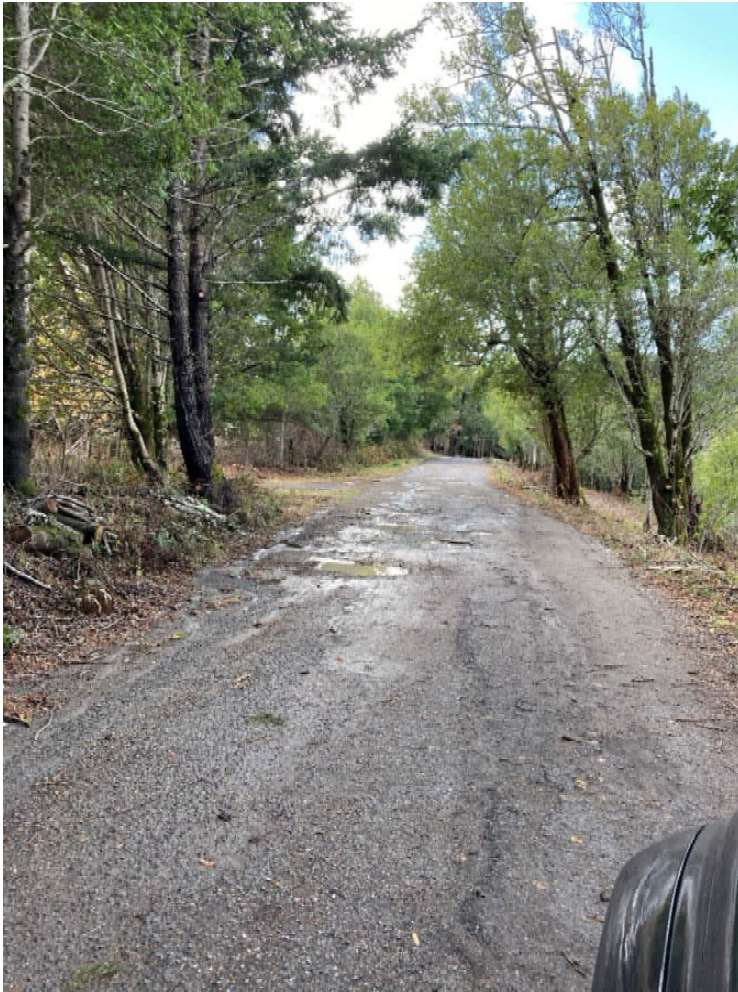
RS1 – Representative of RS1 conditions (looking west). Details asphalt road surface, 20' average road width, crowned geometry and fair road drainage, average slopes <5% - max 10%.
